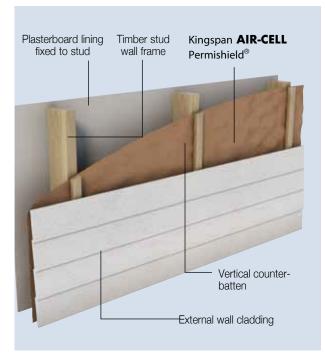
K ingspan AIR-CELL Permishield<sup>\*</sup> in a timber-framed wall installation using counter-battens
